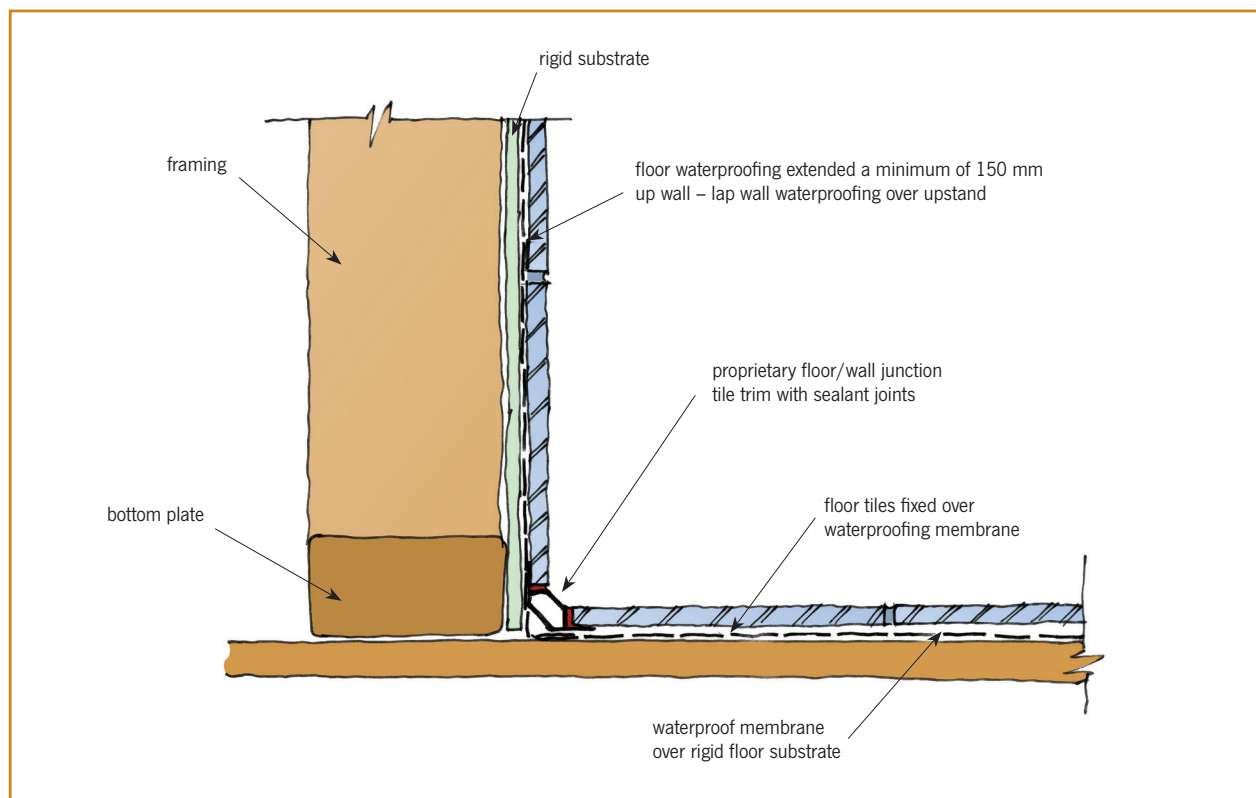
Possible waterproofing detail for floor-to-wall junction. Note that floor and wall waterproofing is usually the same product with a bond breaker at junctions.
